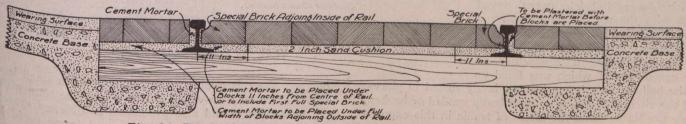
Detail of Rail Section for Vitrified Brick or Scoria Block Pavements.
